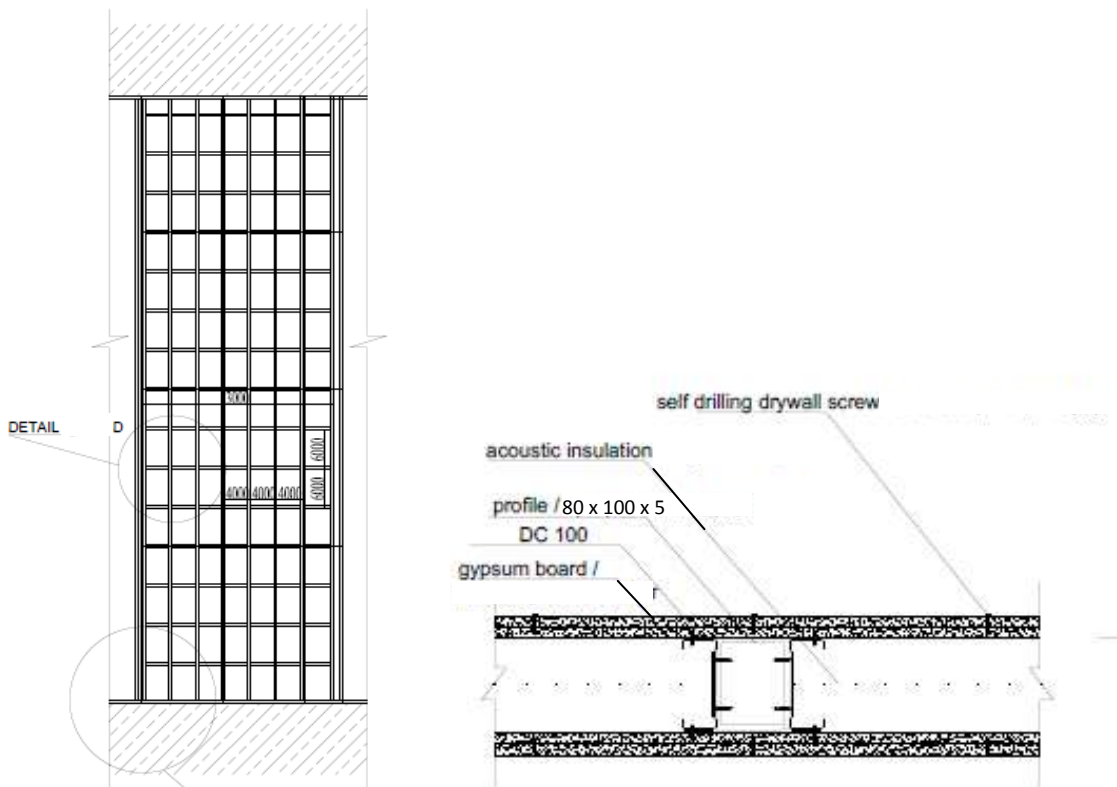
Diagram and cross-section of internal façade (atrium) of gypsum board.
